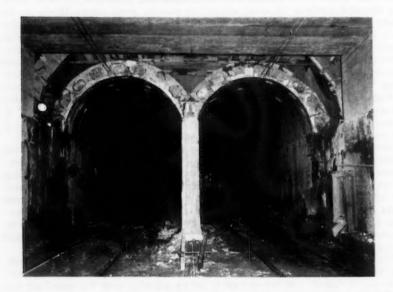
VIEW OF RAILWAY TUNNEL SHOWS THE CONCRETE BEAMS IN PLACE, THE OLD ARCHES, AND ABOVE, THE NEW TUNNEL ARCH WITH REINFORCING READY TO BE CONCRETED.
